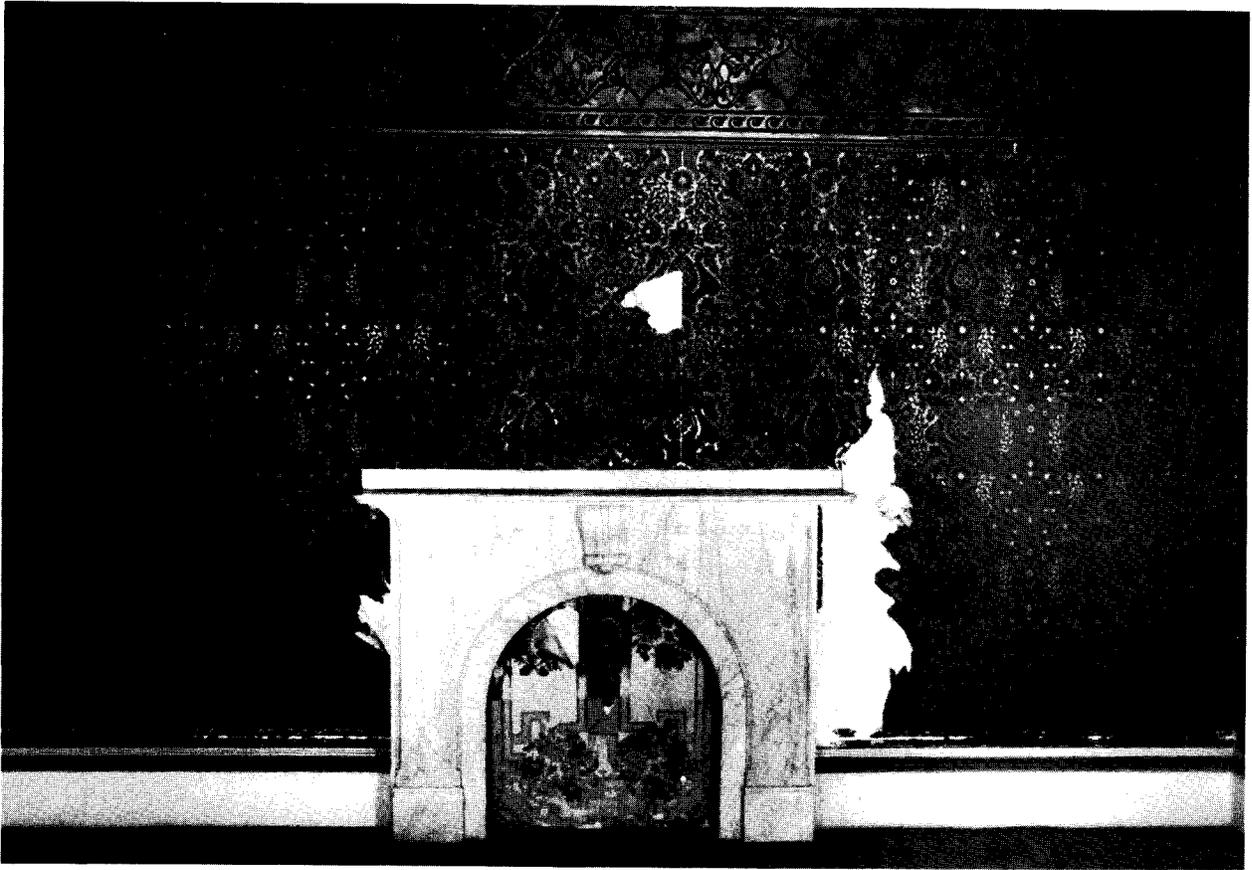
Penniman House: Northwest Parlor (Room 103), East Wall, Showing Historic Wallpapers (1981).
